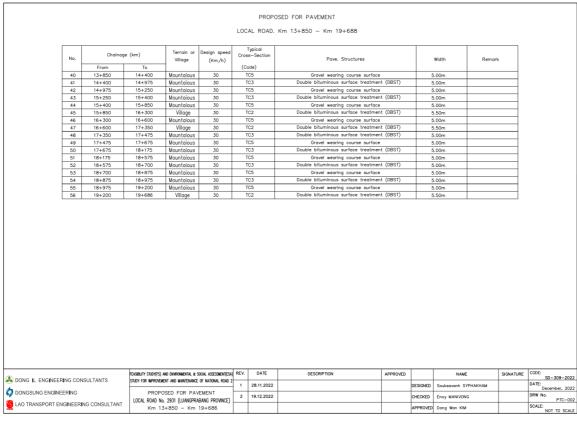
Type of Pavement Proposed by Chainage of Local Road No. 2931-3170
